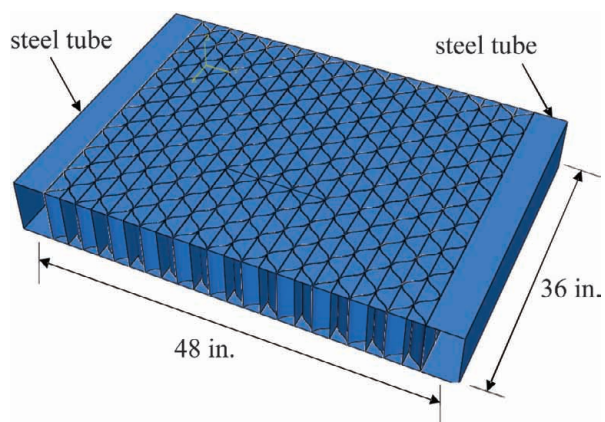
Steel tube FE model: 36 inch overhang/48 inch tube spacing
